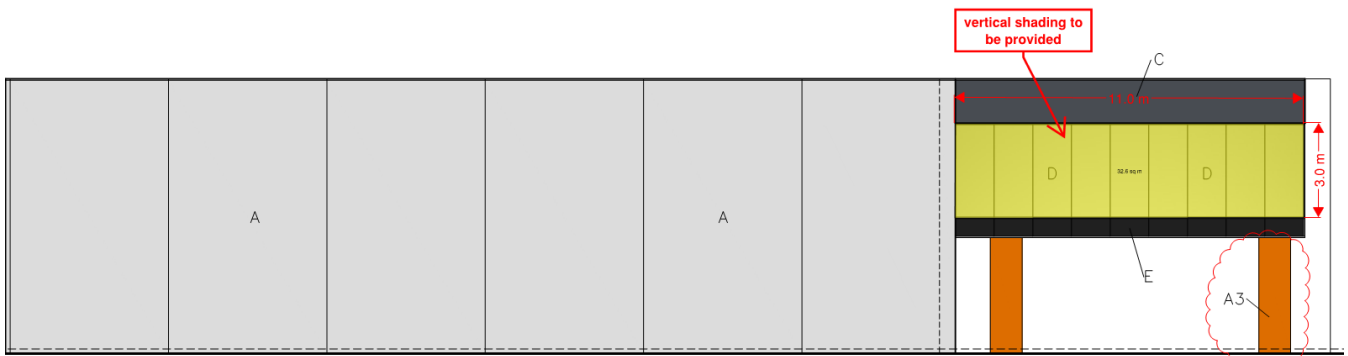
External shading markup of West façade – Vertical Shading to be provided
